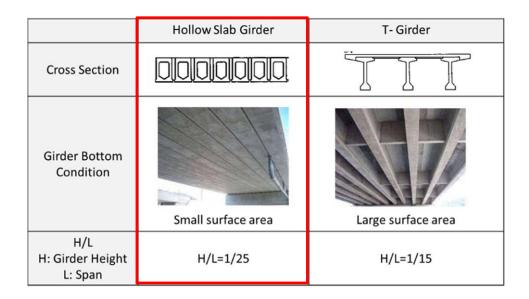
Type of Bridge on the Palmeraie Road (Typical cross-sectional drawing for comparison)
